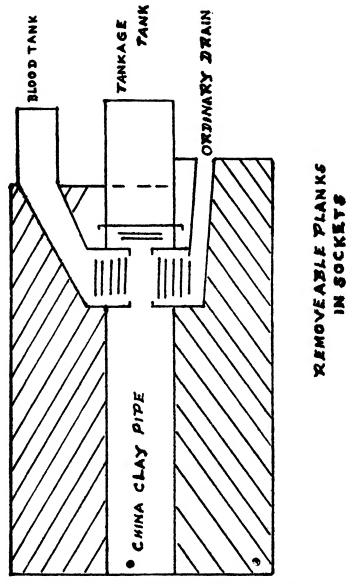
Showing recommended lay-out for slaughter-house flooring.
